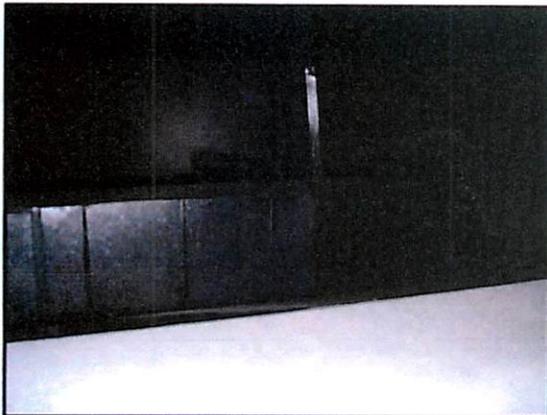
North wing, east restroom exhaust ventilation to outdoors
